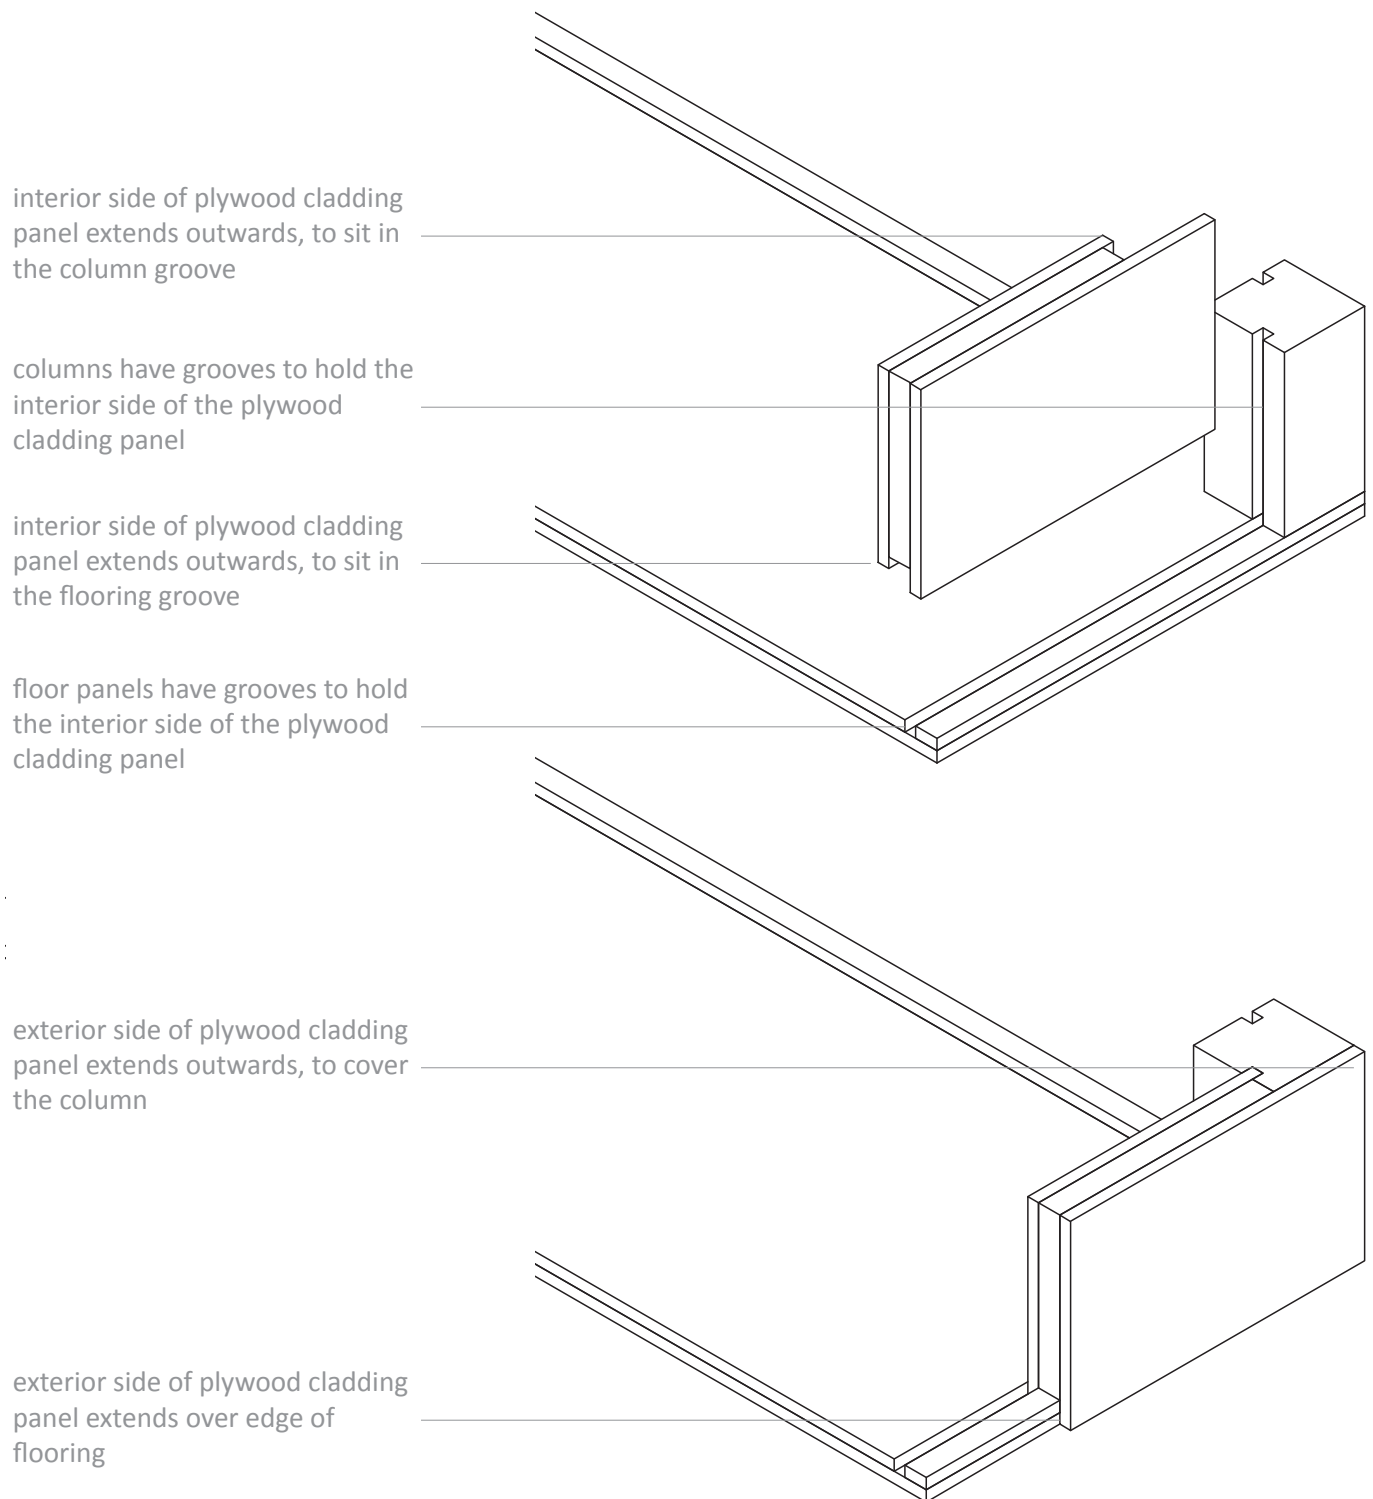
Cladding panel to floor and column connection detail - scale 1:10
